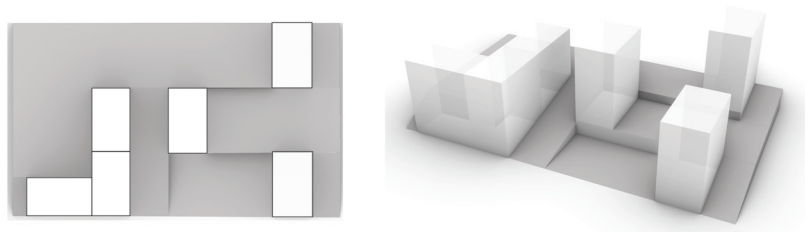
Plan (left) and 3D model (right) of the studied residential building complex.
